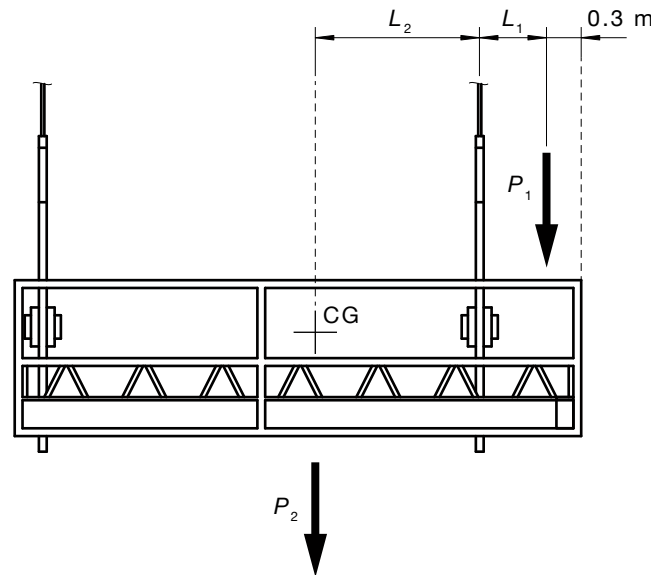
STABILITY OF CANTILEVER CRADLE
